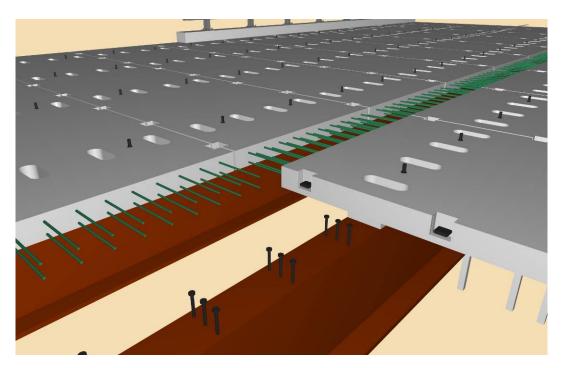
Typical Precast Concrete Deck Panel Installation
